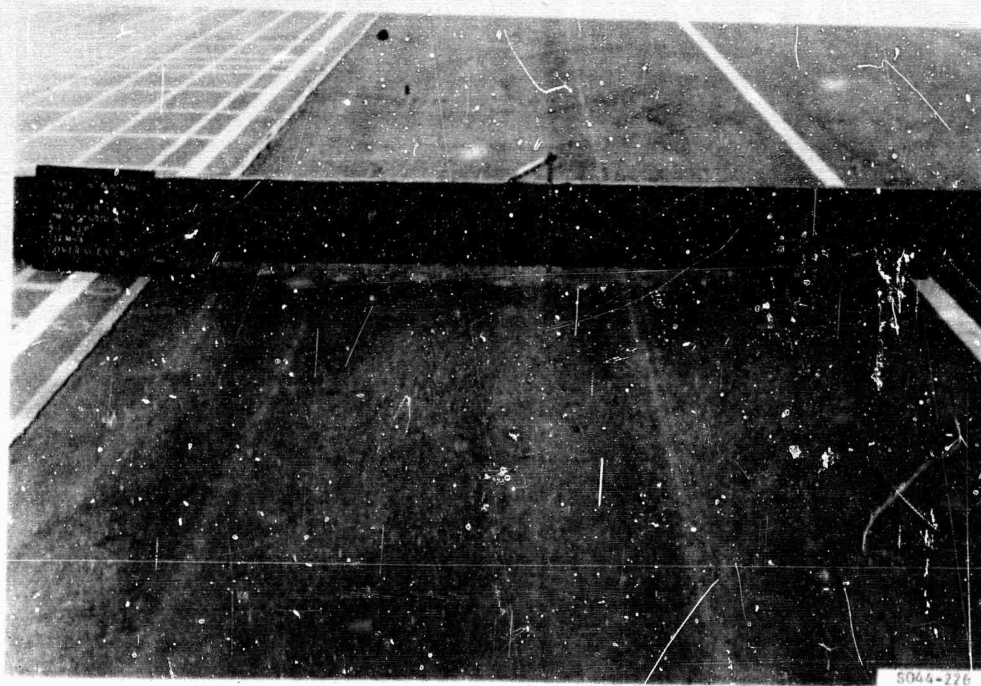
Failure of Flexible Pavement in Item 4, Lane 3B, Caused by Subgrade Shear Deformation
